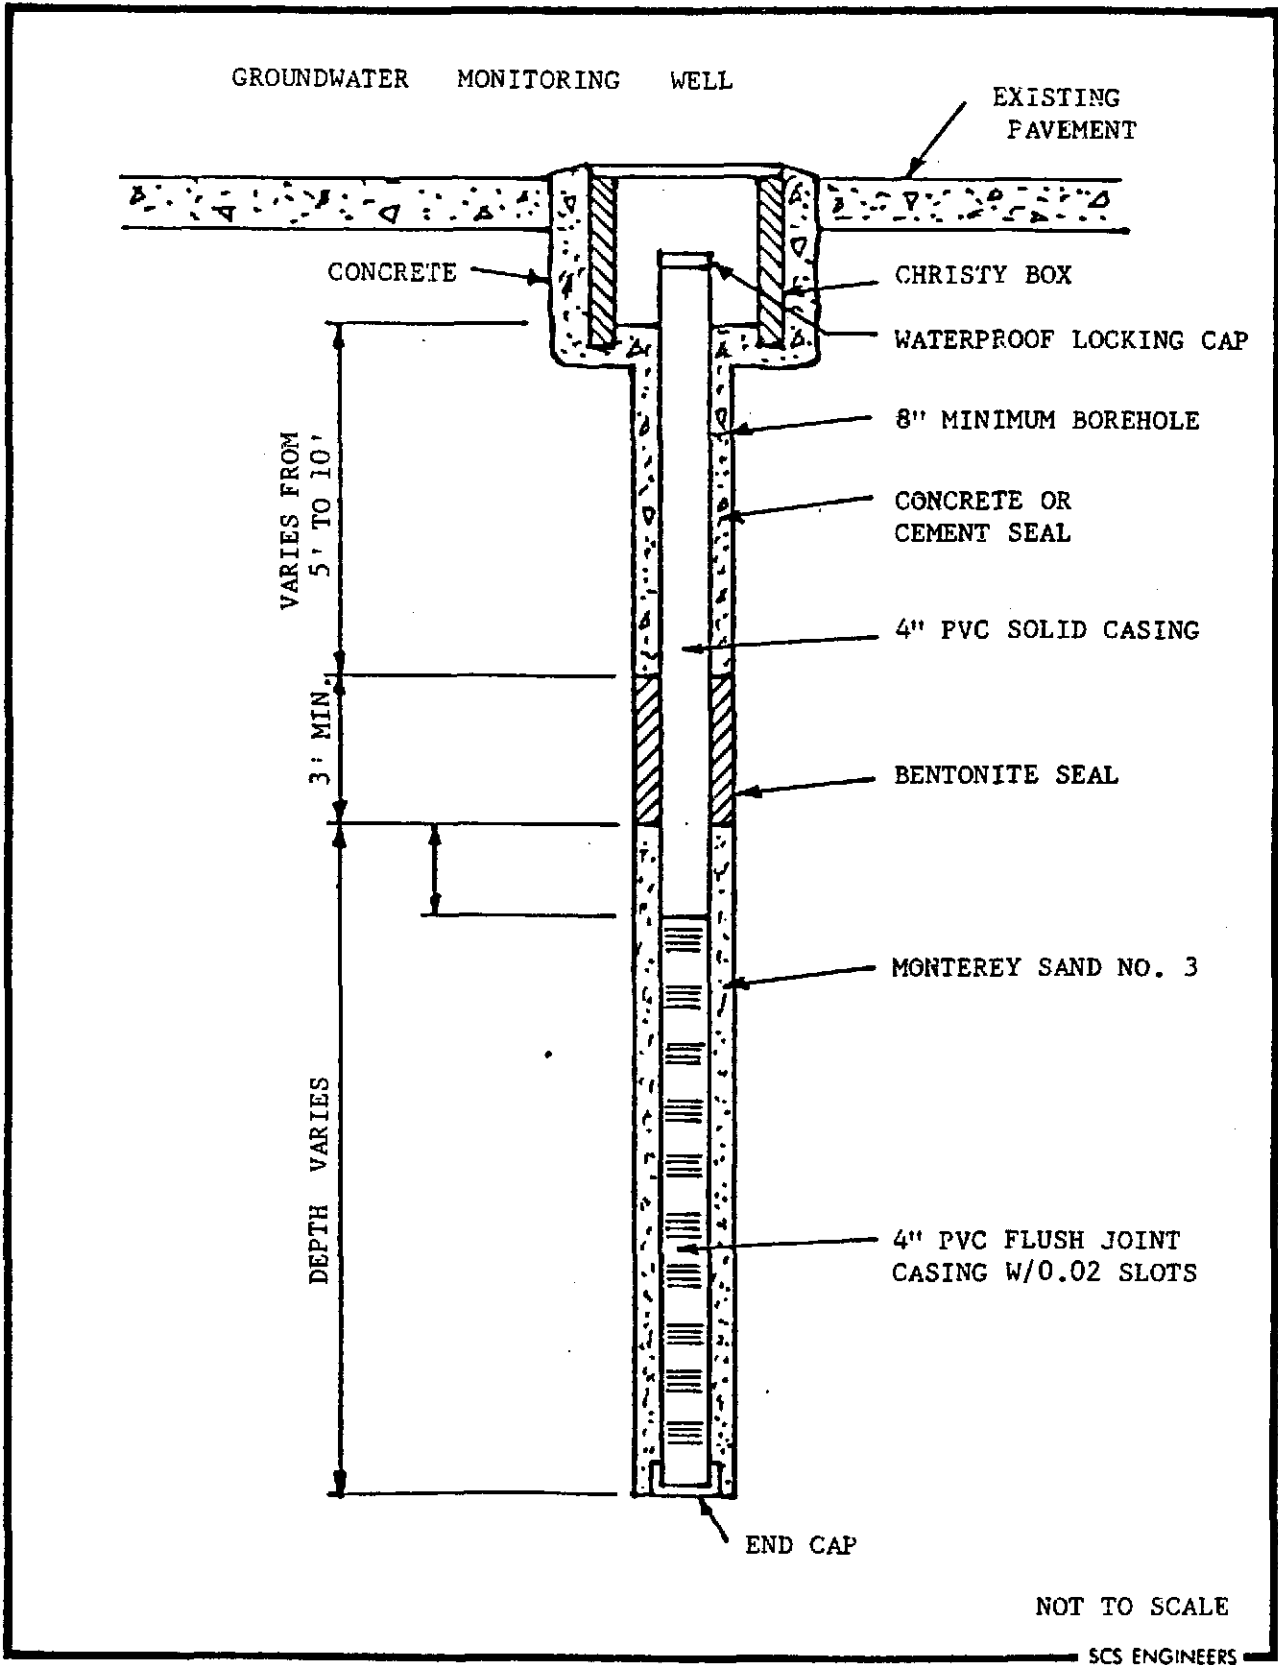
Typical Well Construction Details for the Installation of Groundwater Monitoring Wells
